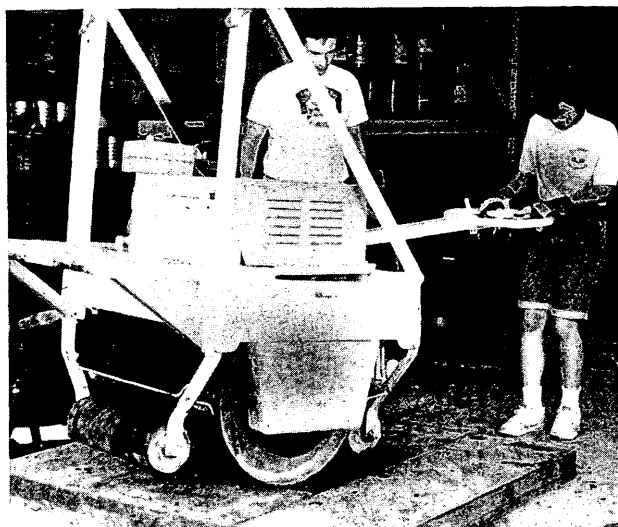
View of the mold and rolling wheel as part of the UCB compaction procedure.
